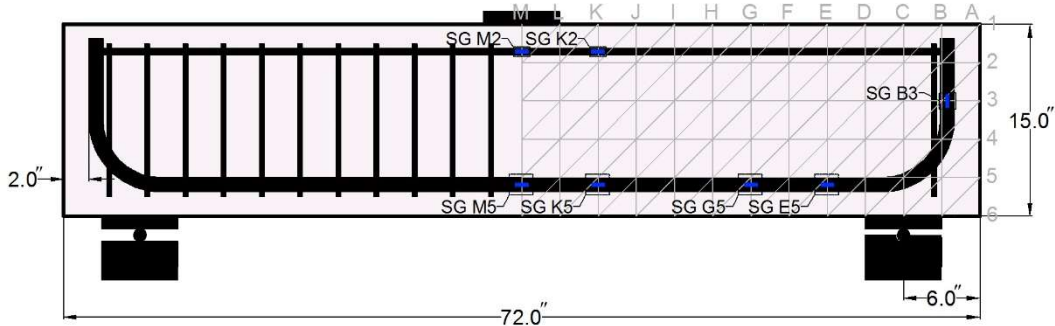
Layout of strain gauges on reinforcement of typical RC & SNFRC beams
